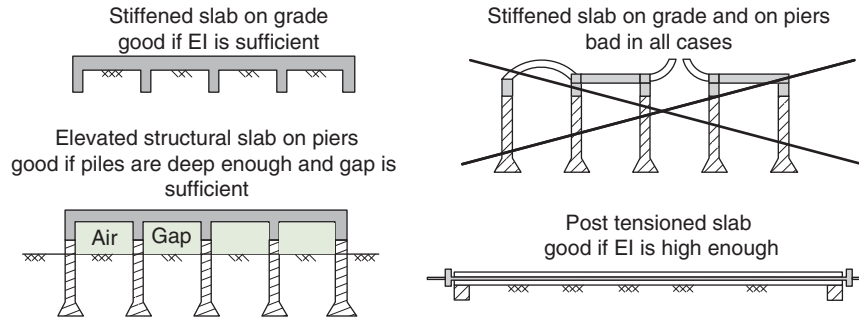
Types of foundations used for light buildings on shrink-swell soils.
